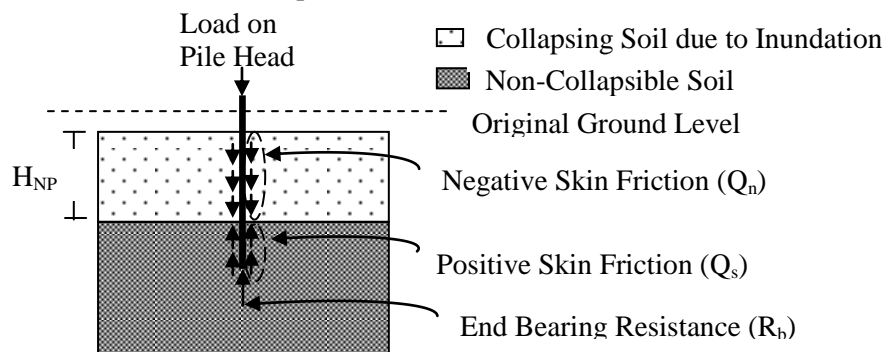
Load transfer mechanism: Pile in collapsible soil during inundation
